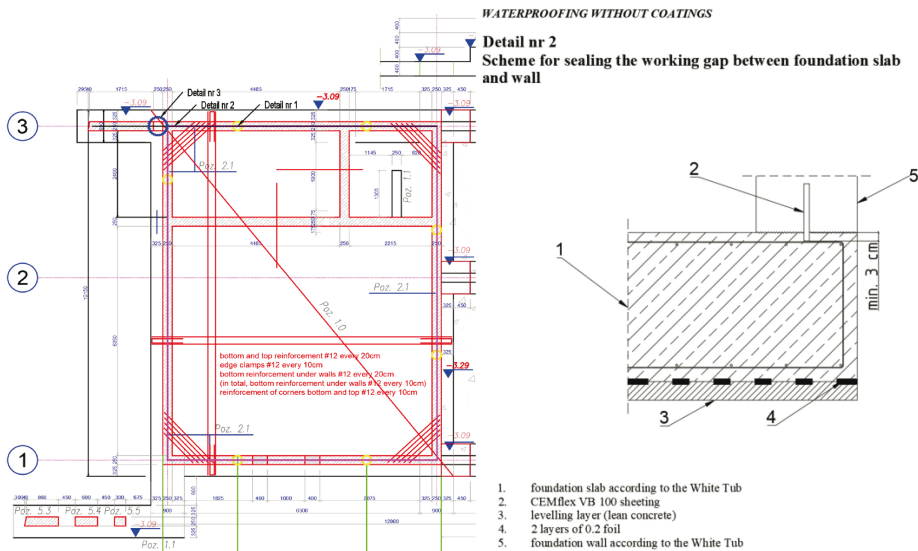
Plan of foundation slab with location of WCS sealing products and detail of executed joint between slab and wall, own elaboration
